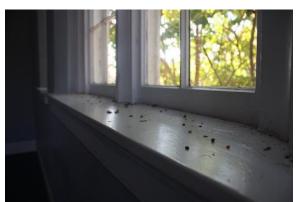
, Historic Courthouse, Second Floor, Room 216, view of dead insects at sill of center window of west wall.
